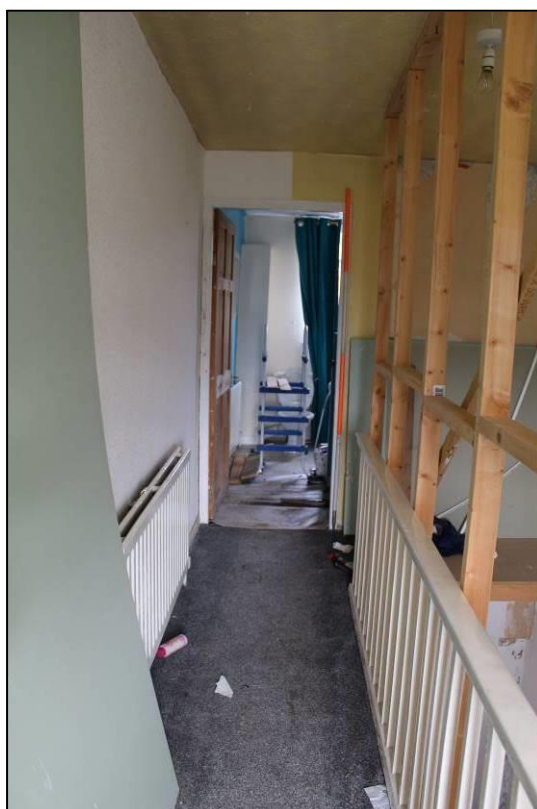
Building A: Room A2.6: view southeast, 2m scale
